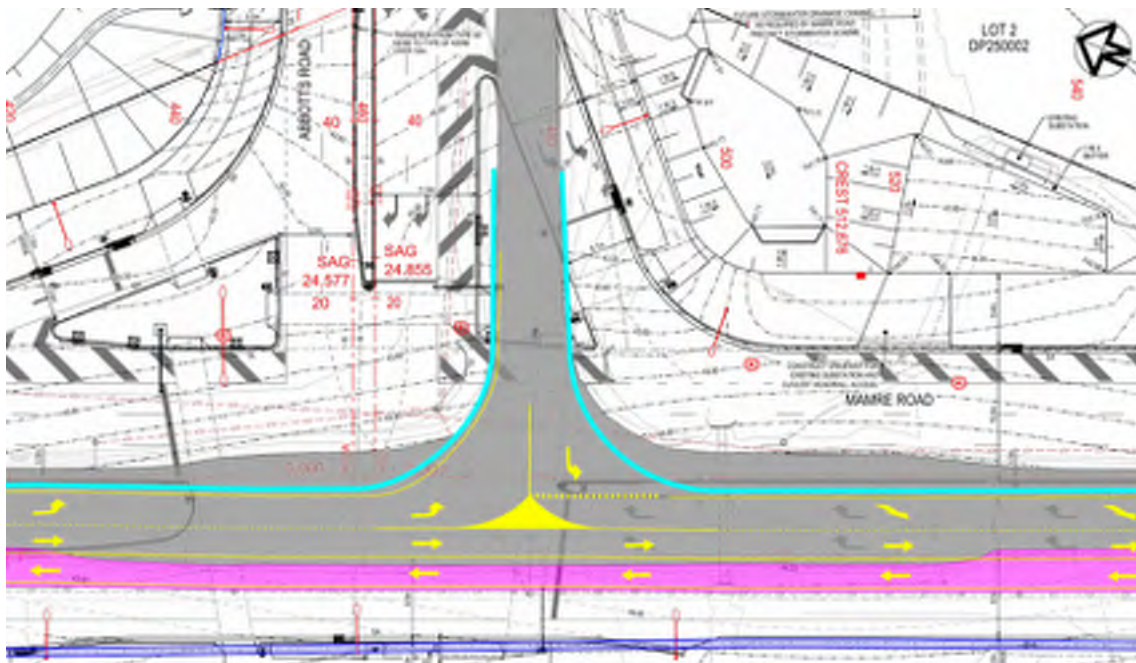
Temporary Road works, Mamre Road/ Abbots Road, Kemps Creek
